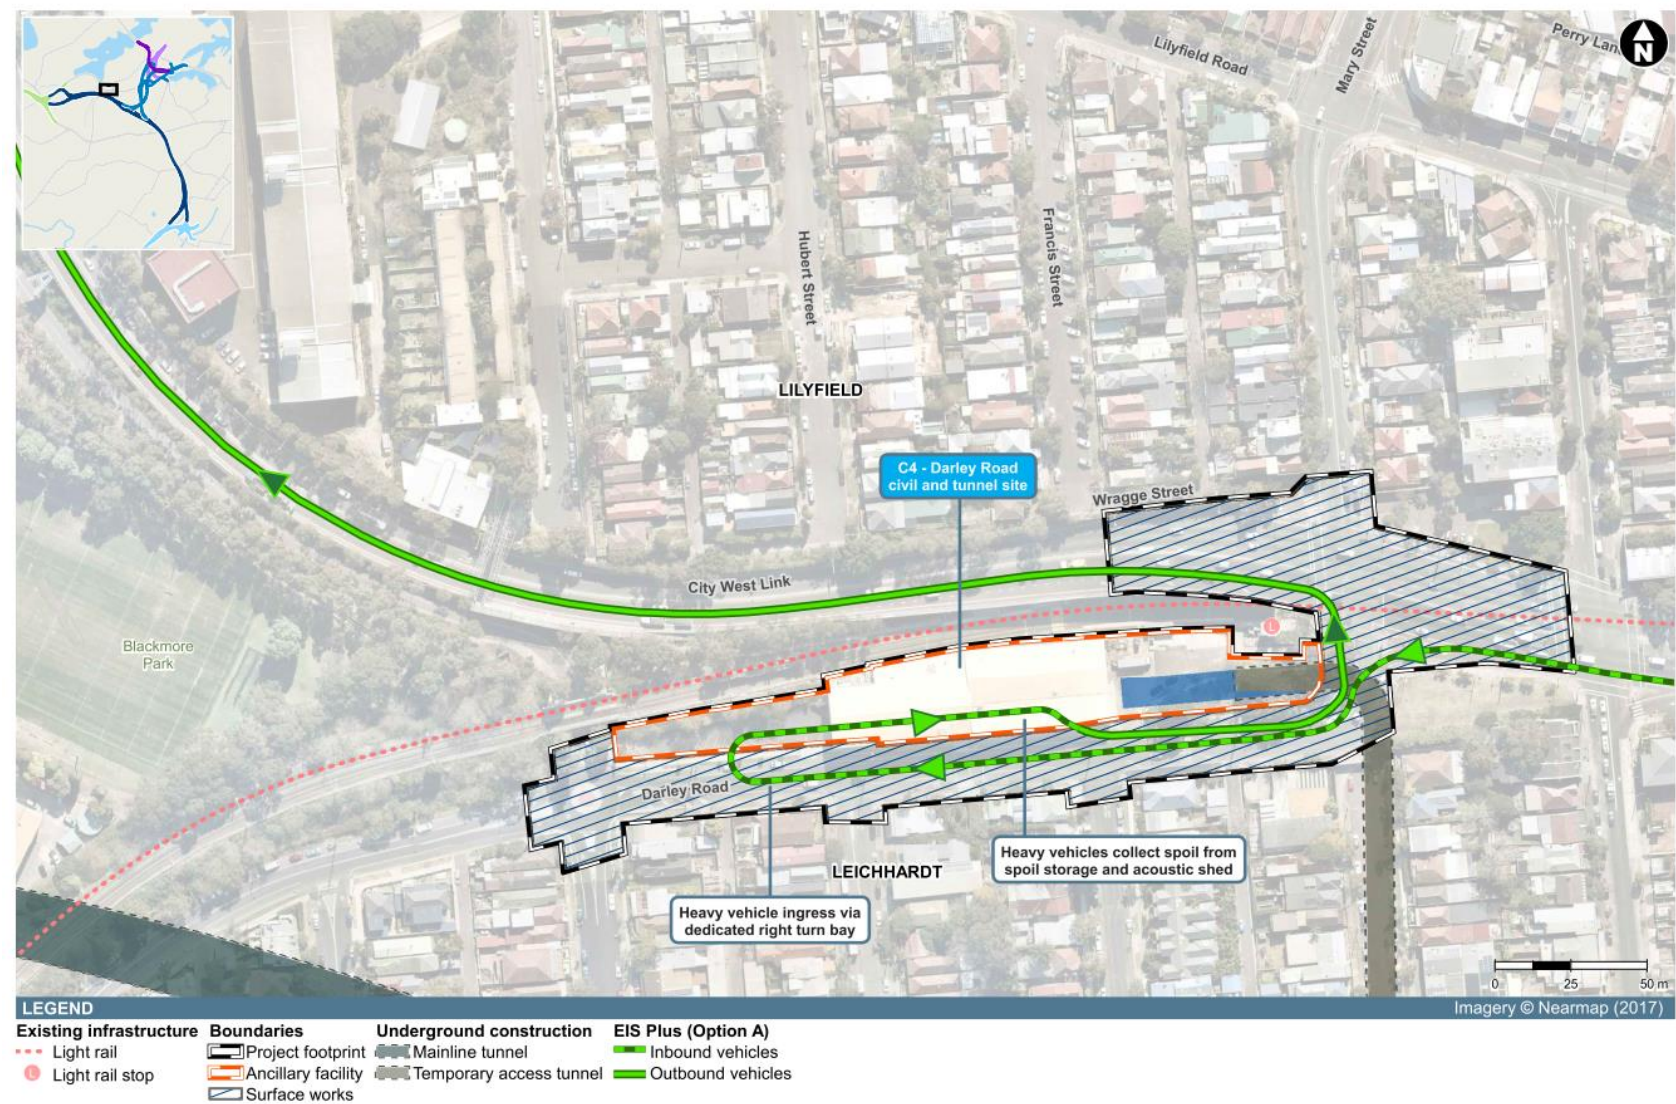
Indicative spoil haulage route – Darley Road civil and tunnel site (C4)
